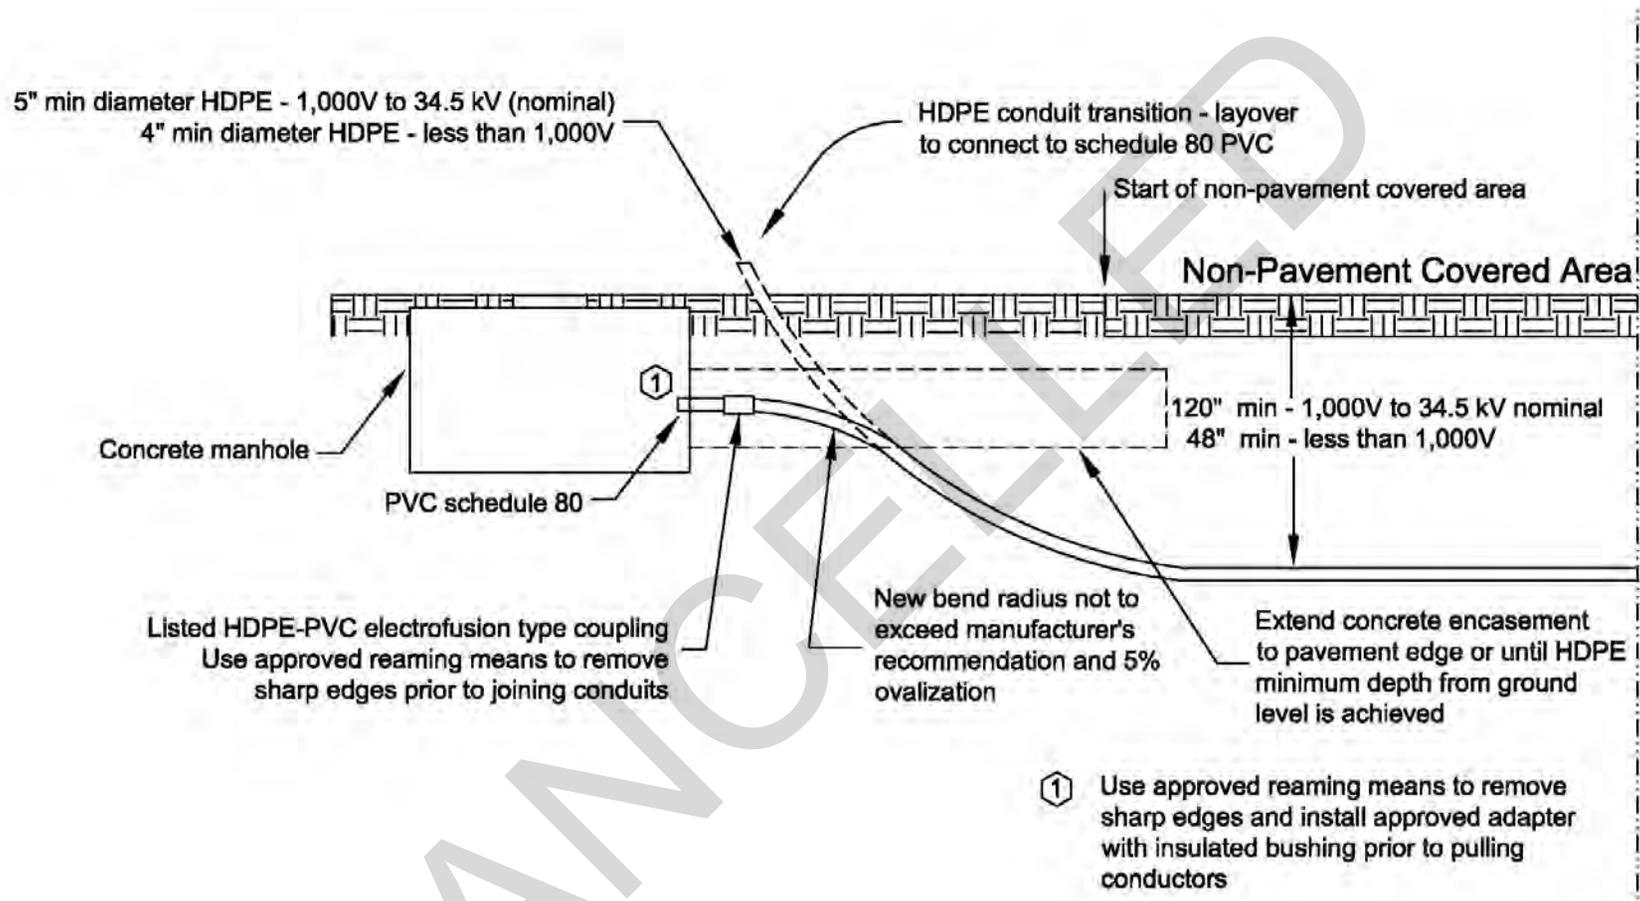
HDPE-to-Manhole Pavement Covered Area Transition
